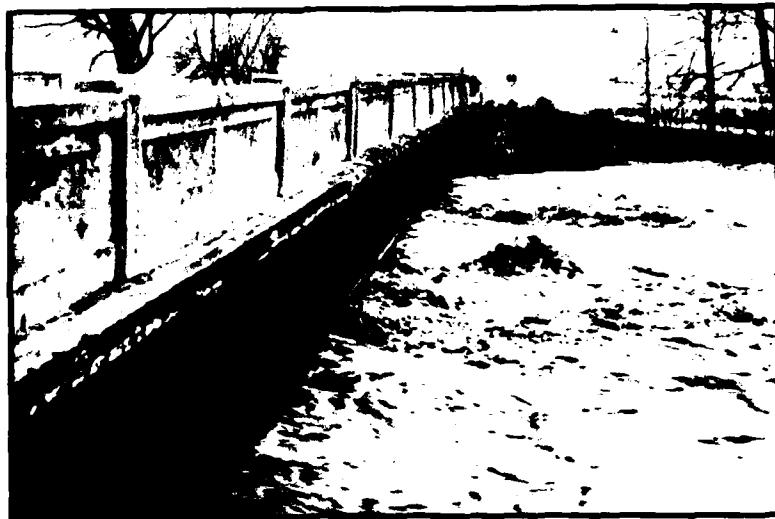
Looking south from the north abutment at the downstream side of the Transit Road bridge during the March 1955 flood.
